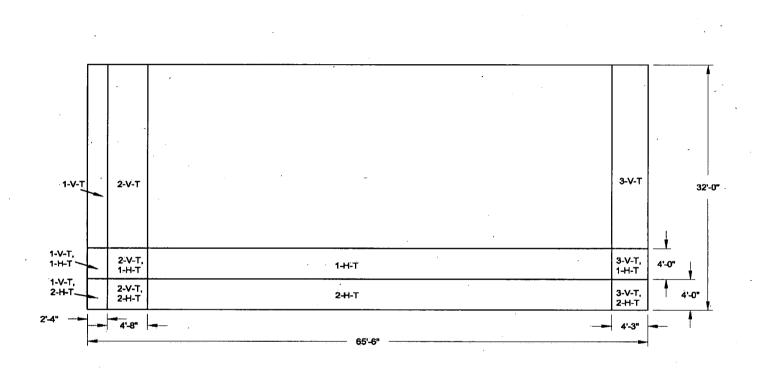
H.6-172: WALL & LOOKING FROM OUTSIDE TRANSVERSE REINFORCEMENT ZONES
